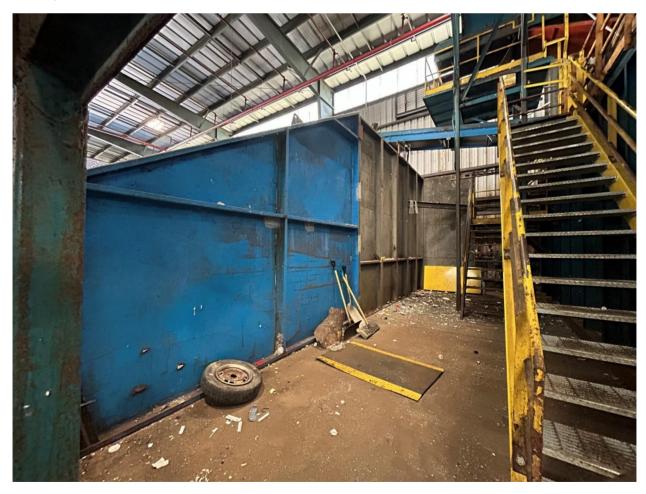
Push wall (NOT to be removed) adjacent to hopper that separates main processing equipment from tip floor.
